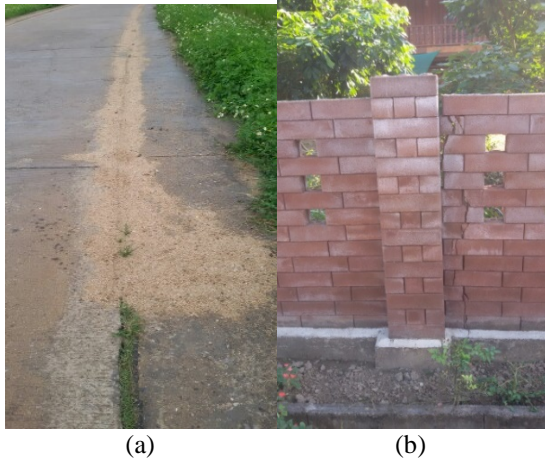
(a) Sand ejected through the joints of concrete pavement, (b) Separation of a wall made from interlocking bricks due to ground settlement.
